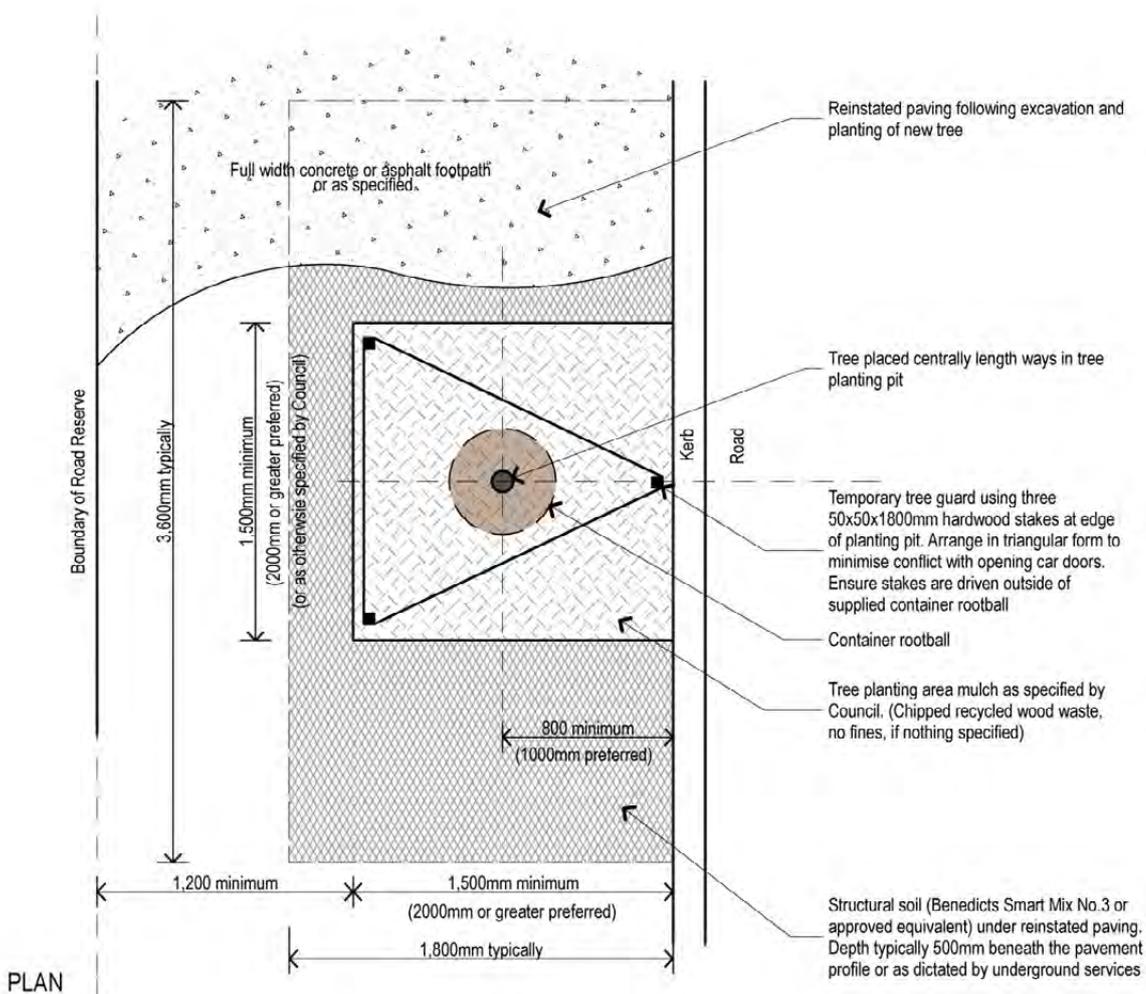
TREE PLANTING IN FULLY PAVED VERGE WITH DEEP SAND SUBSOILS
